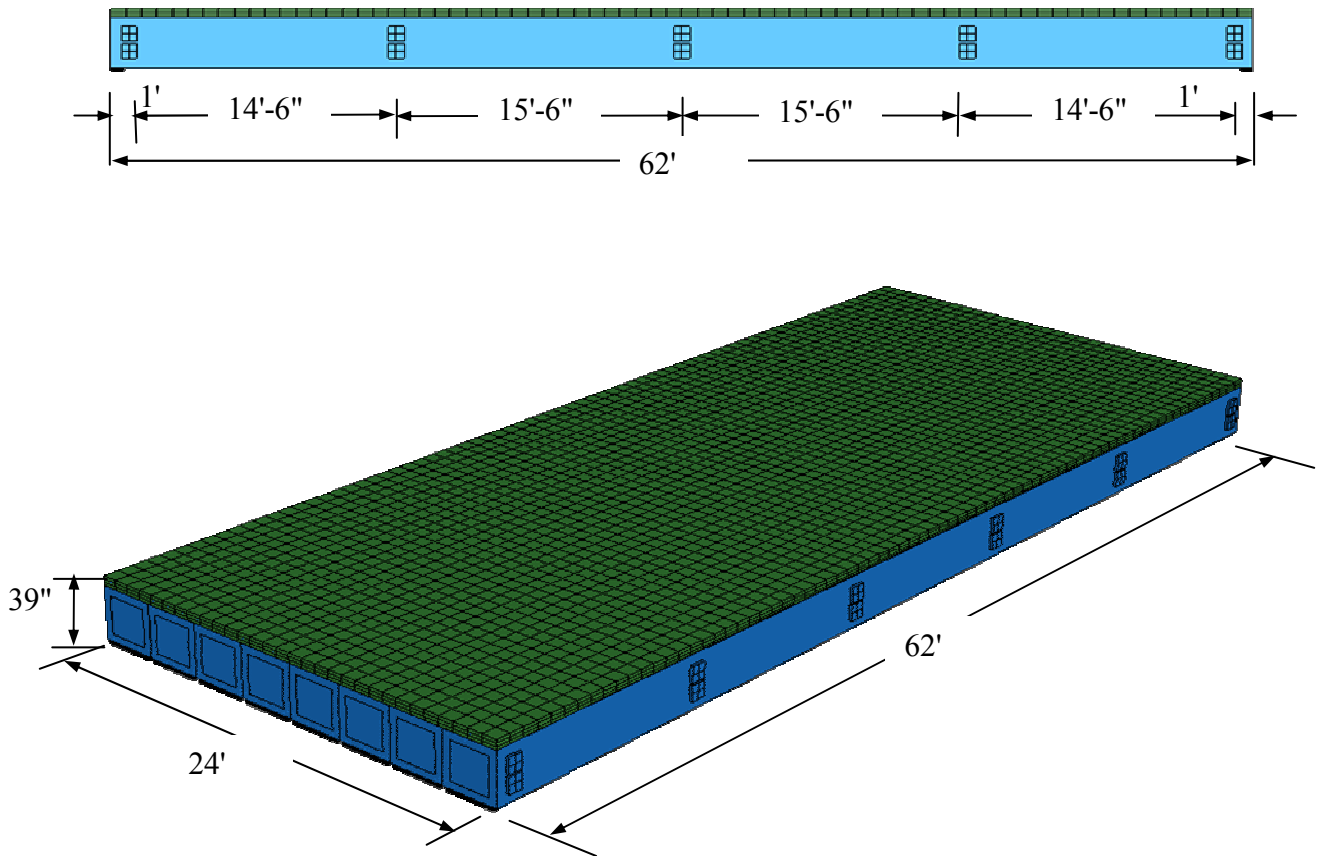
Assembly of 62 ft span bridge model constructed using 36 in. wide box-beams.
